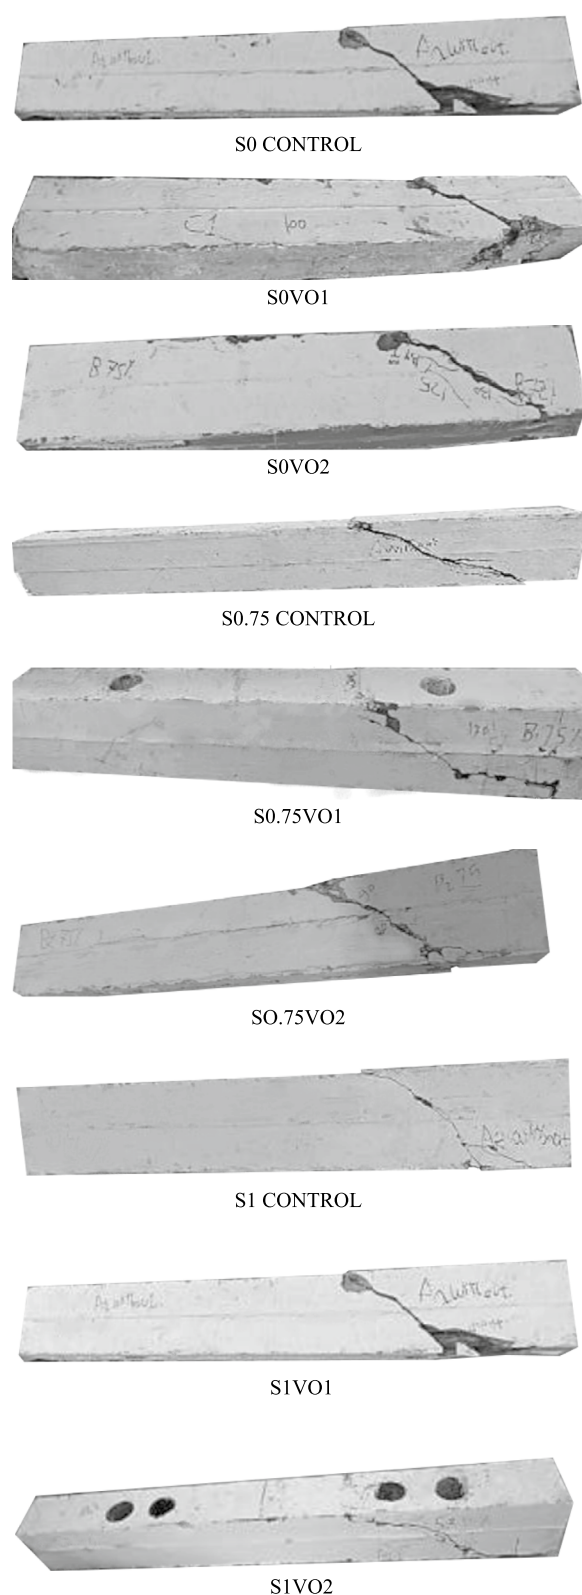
Failure modes and crack patterns of all tested SCC beams
